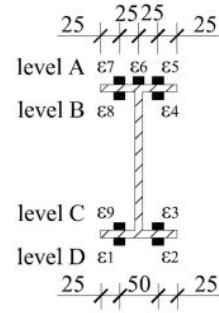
Full-scale flexural failure tests: I200 profile — positioning of the strain gauges at mid-span section (dimensions in mm).
